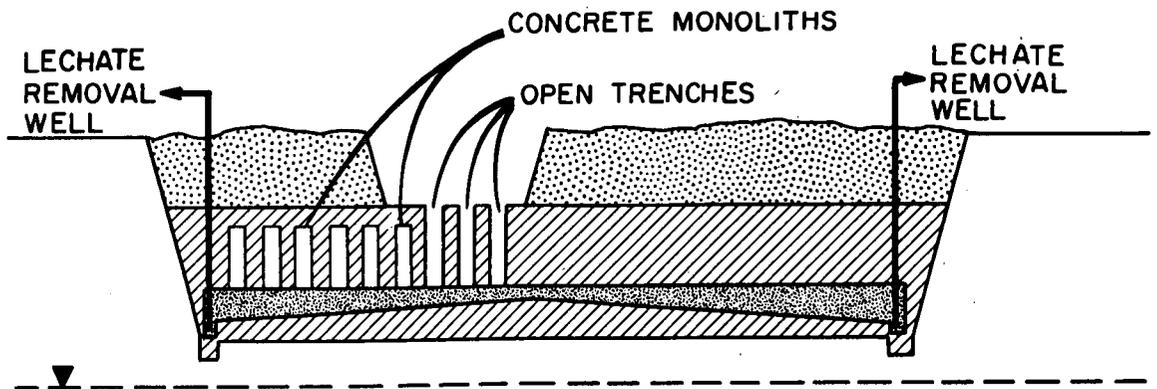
Completed trenches with concrete emplaced and backfilled; open trenches ready for concrete placement.
